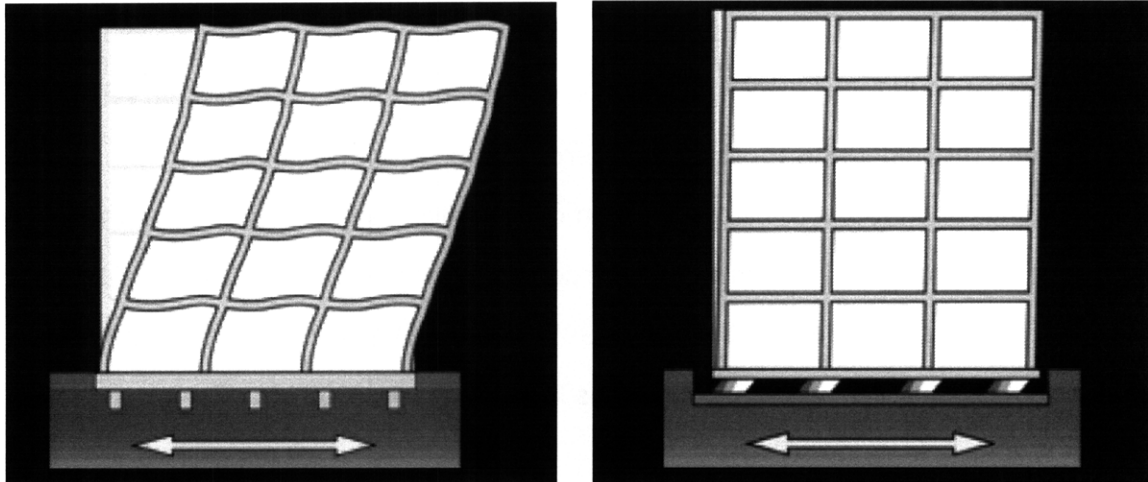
Effects of base isolation (a) Fixed base building, (b) base isolated building (Wang, 2002)
